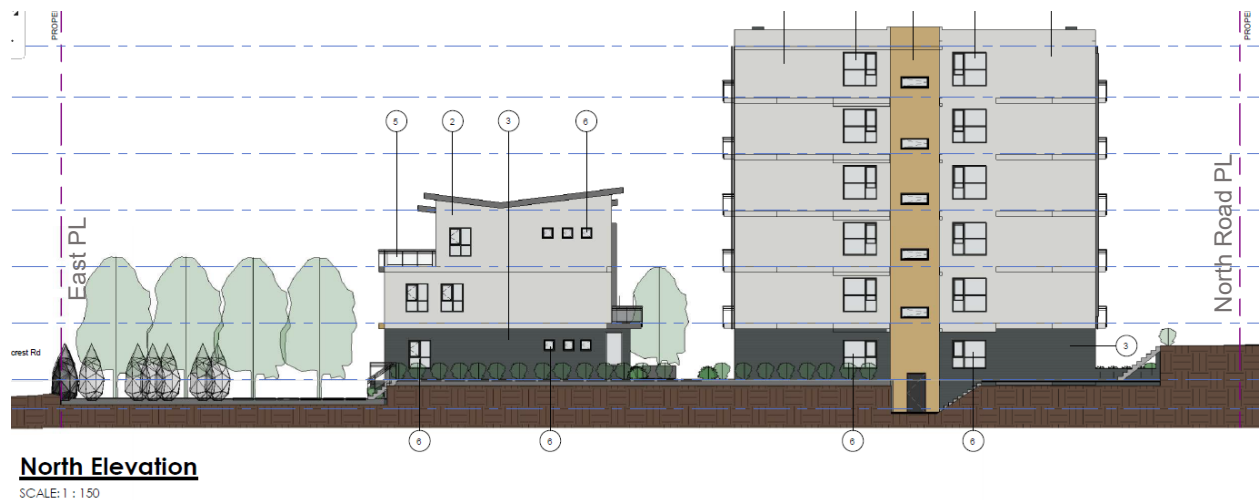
North Elevation, adjacent to a vacant neighbouring property fronting North Road and a single family residential property Fronting Cascade Crescent.
